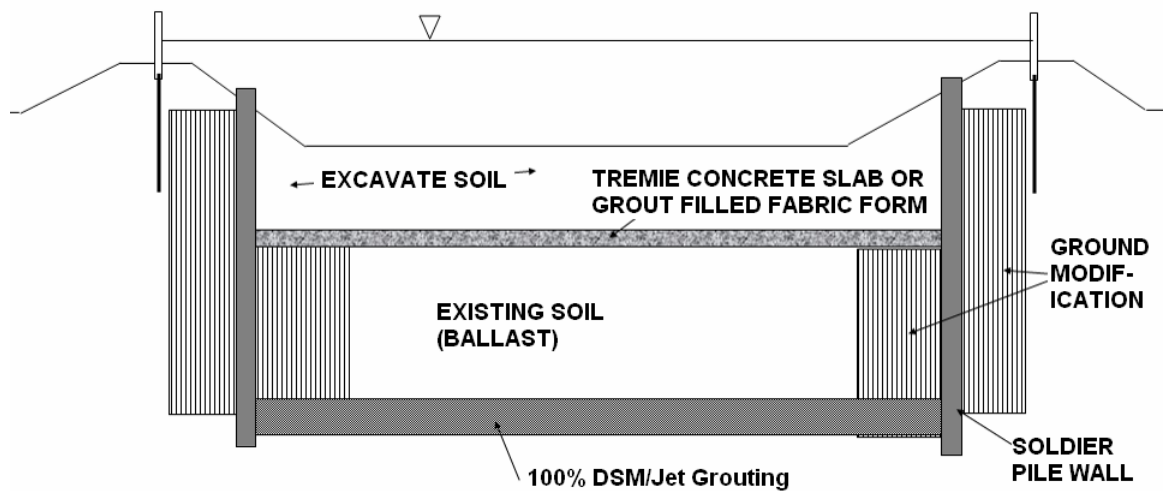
Deep Soil Mixed Seepage Cutoff with Vertical Walls and Concrete Slab
